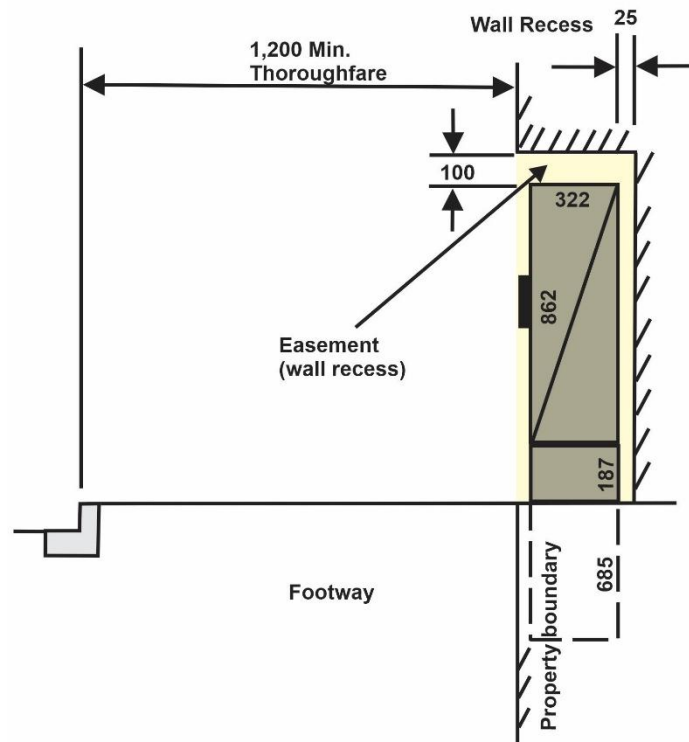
Commercial pillar elevation – off-street in a wall recess.
